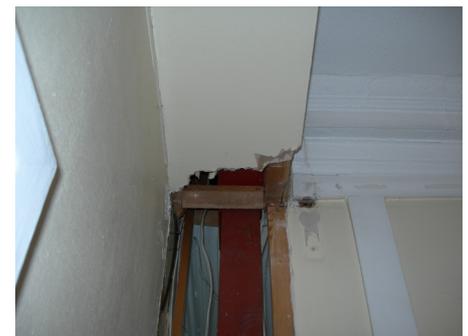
(right) Existing steel post in 1st floor level rear room to be replaced by two 50x100mm posts concealed between stair and room panelling
